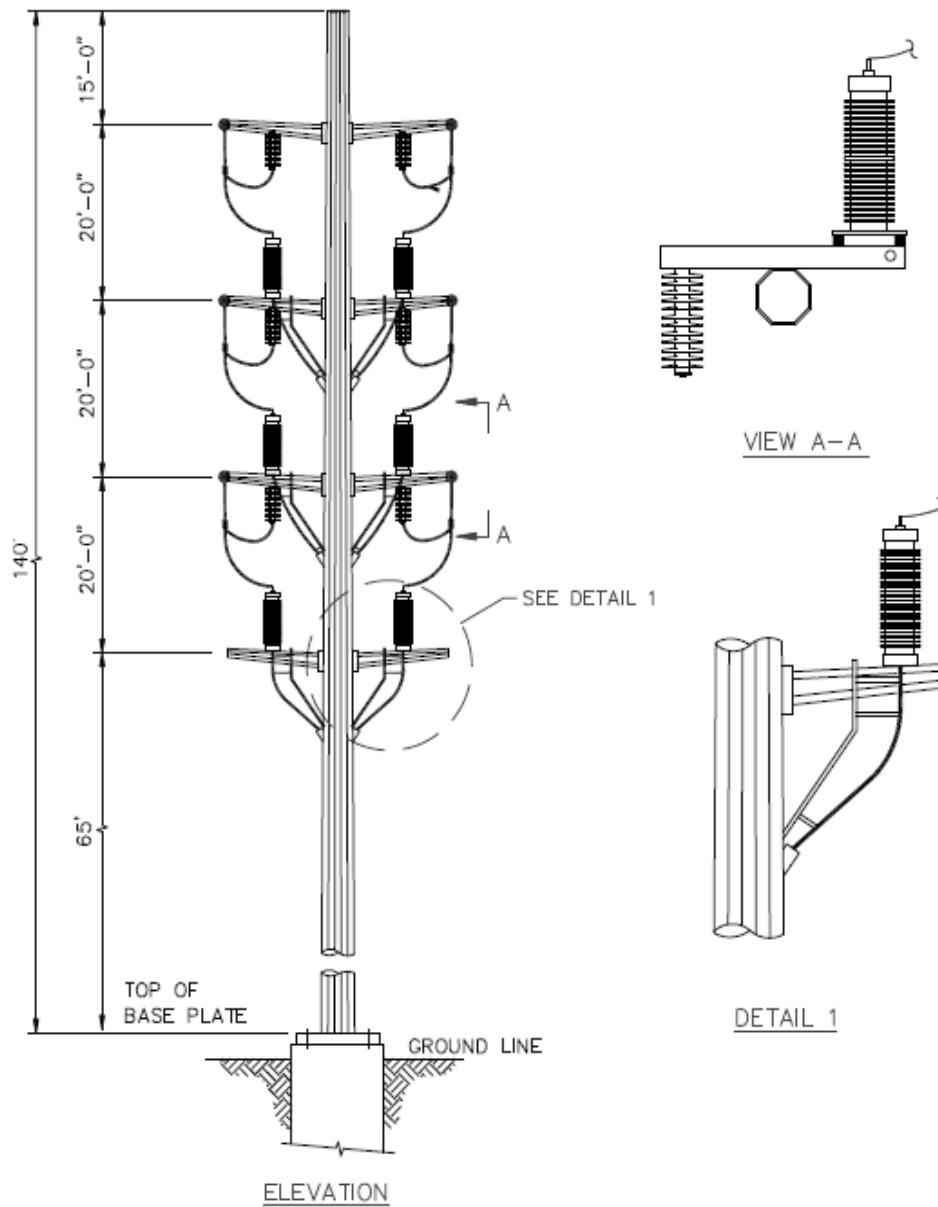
Proposed 12-kV Steel Riser Pole, (typical)
